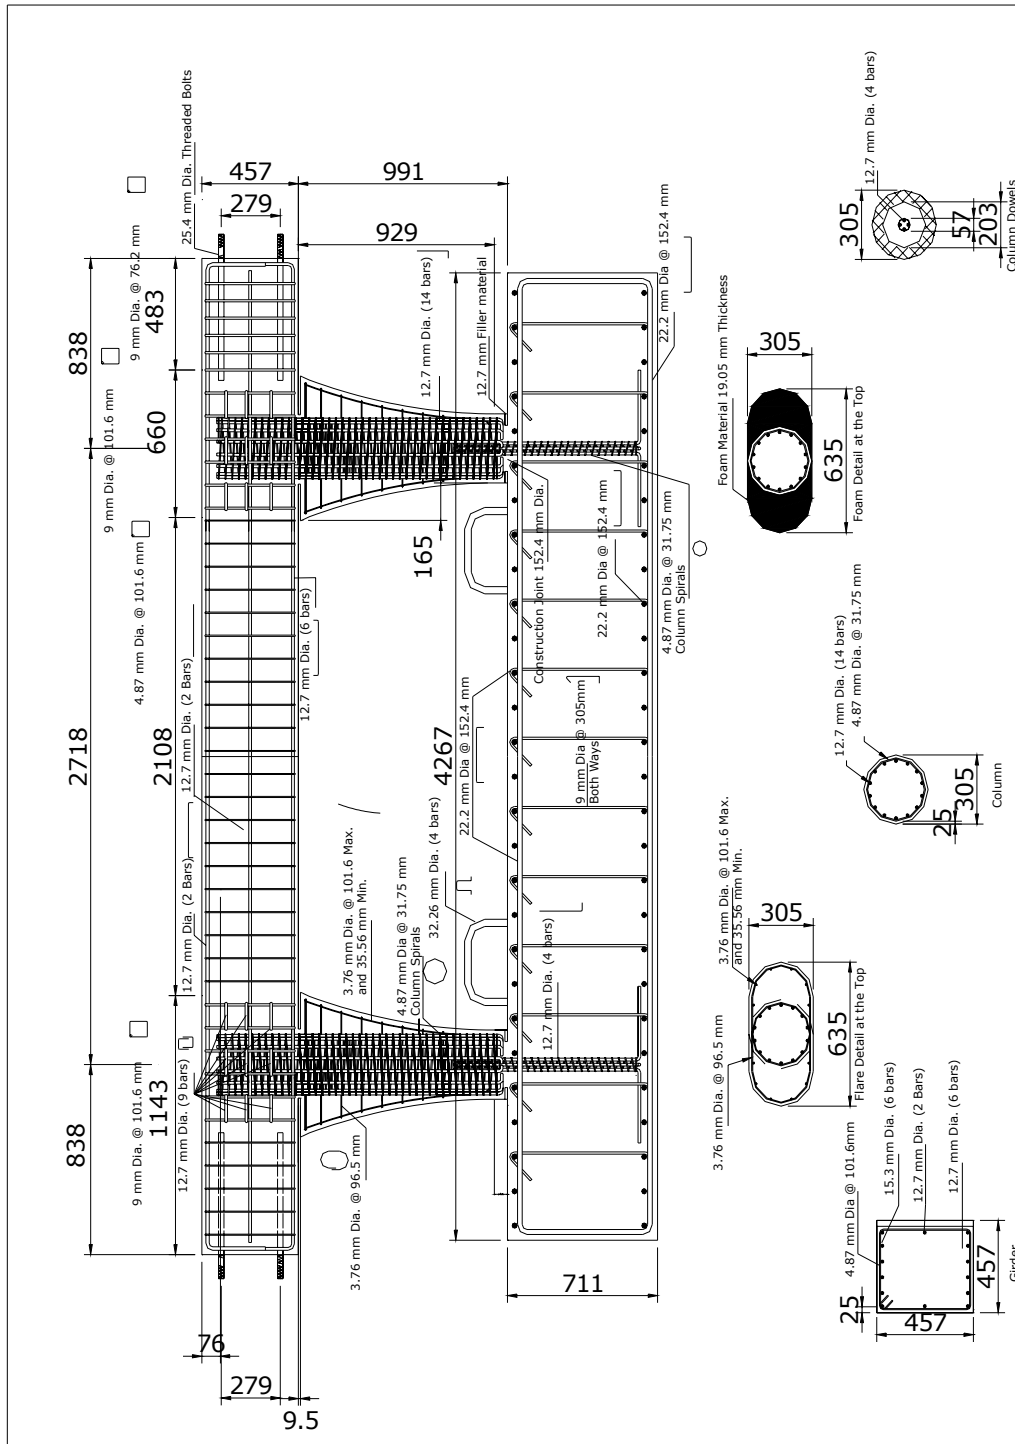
Reinforcement Details of SFCD2S (Metric Units)
